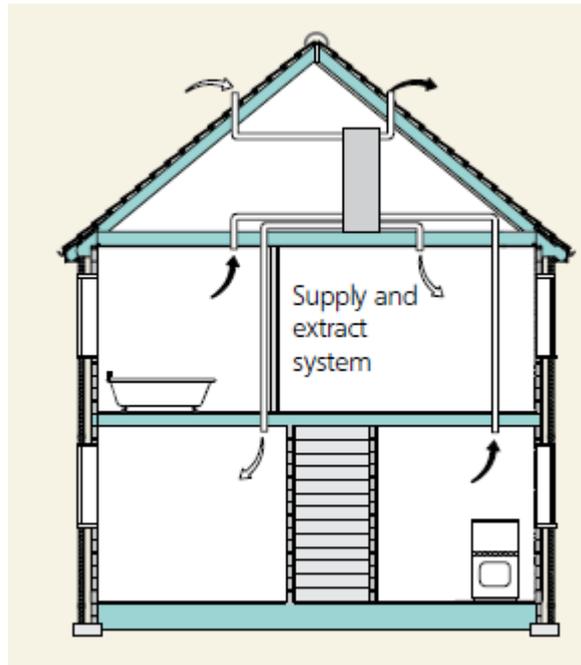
Whole House Mechanical Ventilation with Heat Recovery (Source: GPG268)
